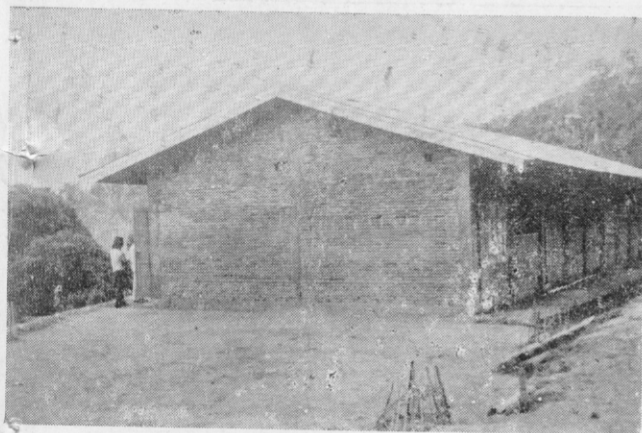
, 12 Primary school at Gitgit, Bali. Indonesia New construction after July 1976 earthquake. RC posts under each wooden truss, Ring beam at plinth, none at lintel or eave level, Brick wall panels, brick, gable, Quality of construction substandard
